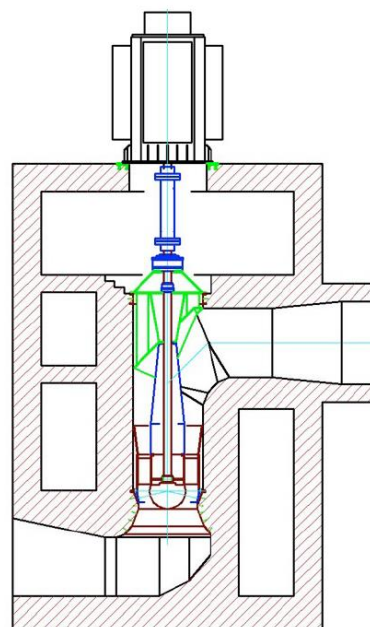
Concrete column pipe (Andritz – Vertikale Rohrgehäusepumpen)
